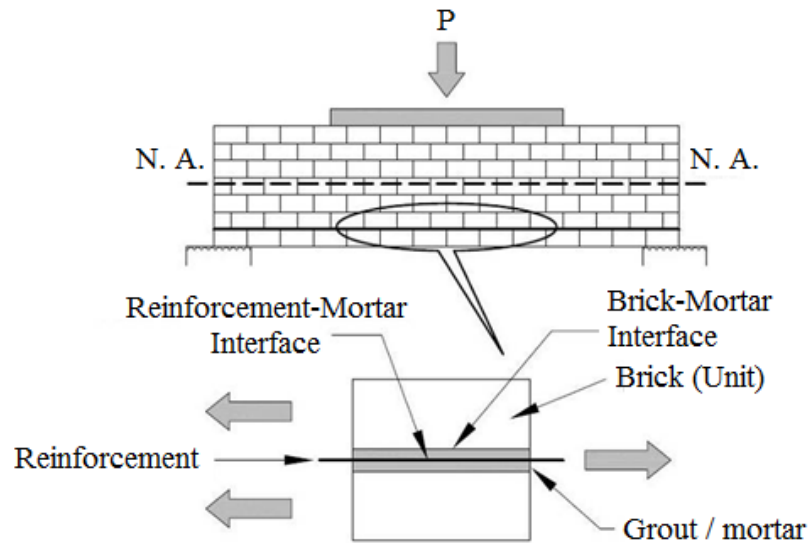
Typical reinforced masonry beam and reinforced masonry joint details.
